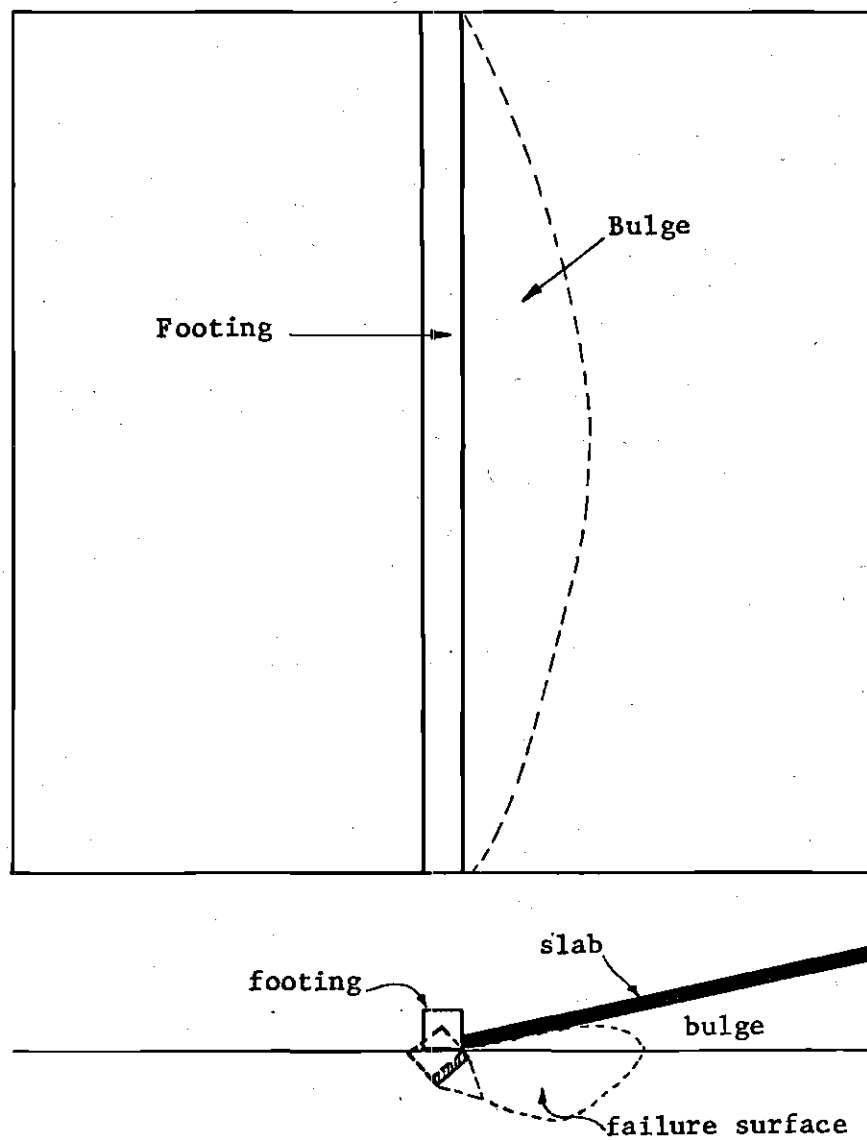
Crack Pattern on Top of Hard Layer for the 22 inch footing--some slabs.
